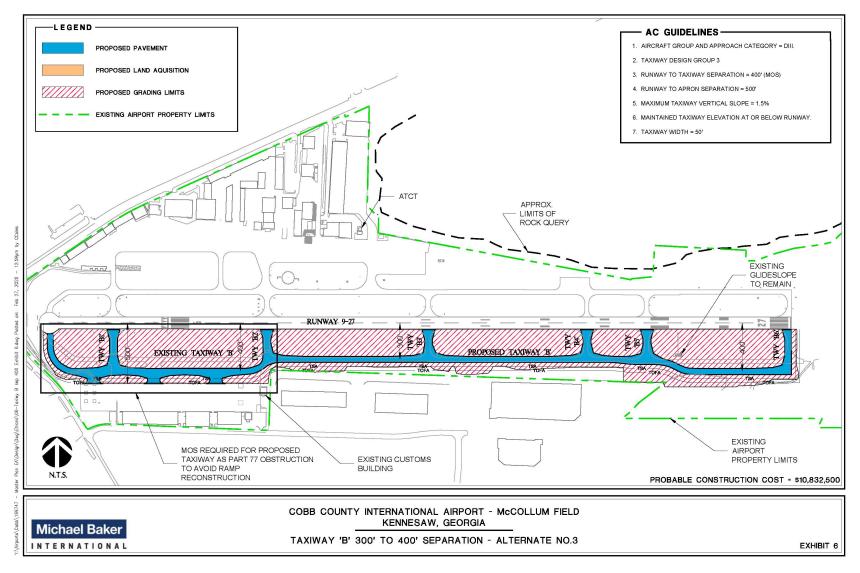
Taxiway 'B' Relocation, Alternative 3c (300-foot to 400-foot Runway/Taxiway Separation)
